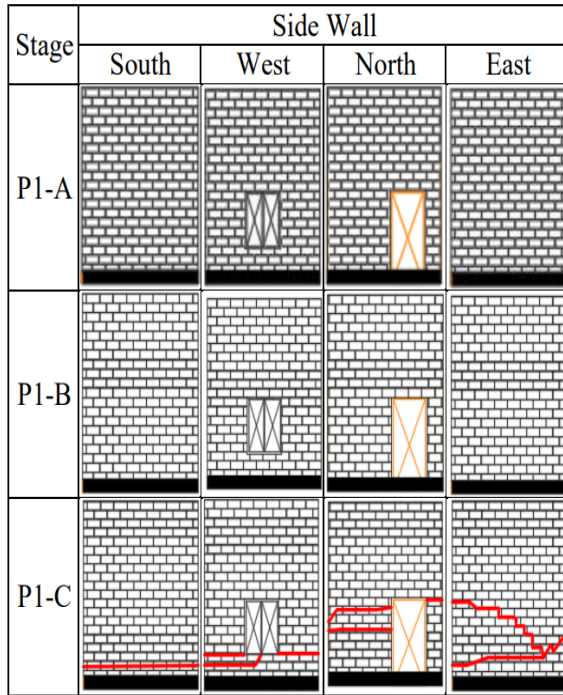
Schematic illustration of crack patterns on B1 specimen until it is severely damaged
